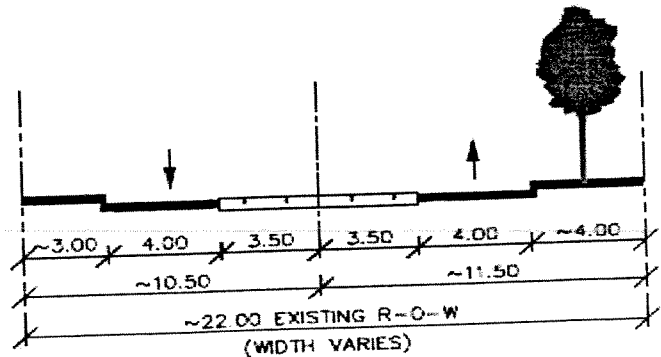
Typical cross-section between Eastern Avenue and Front Street
